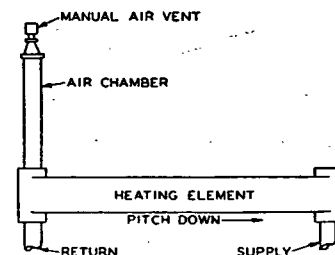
TYPICAL AIR VENT VALVE INSTALLATION ON HEATING ELEMENT
